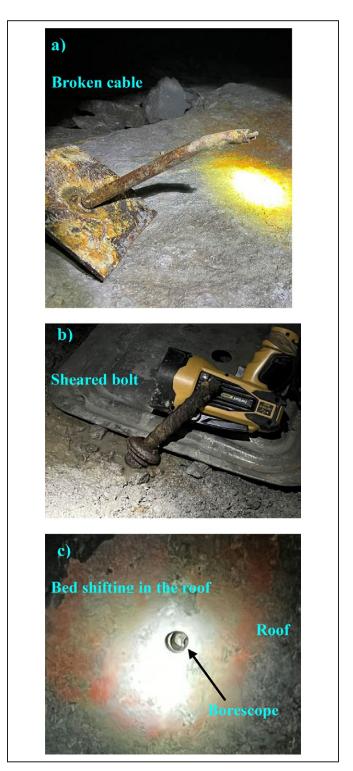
Broken cable, sheared bolt, and roof bed shifting due to high horizontal stresses
